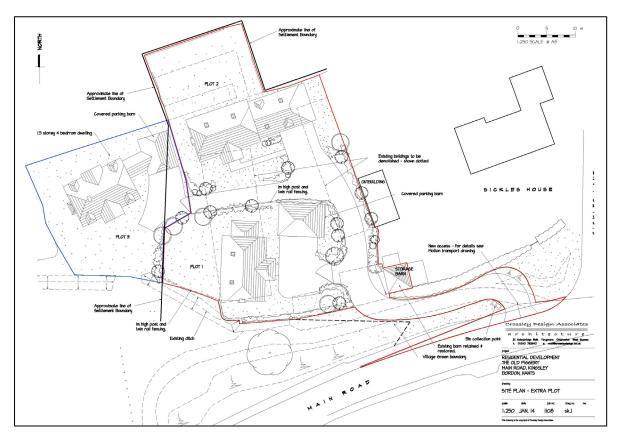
Layout Plan Showing a Detached Dwelling Accommodated on the Objection Site
